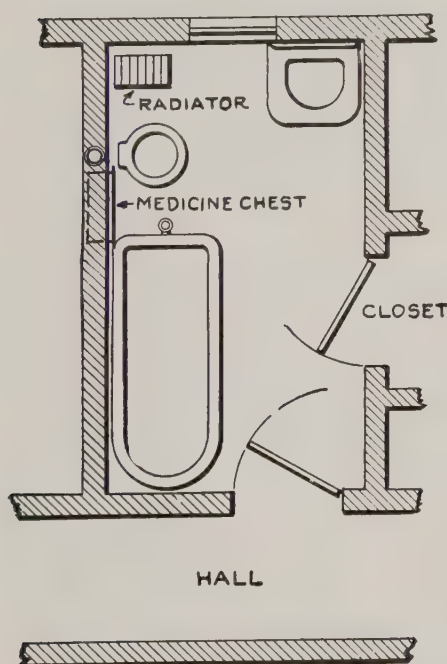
A floor plan of bath room, showing recommended arrangement of fixtures.
